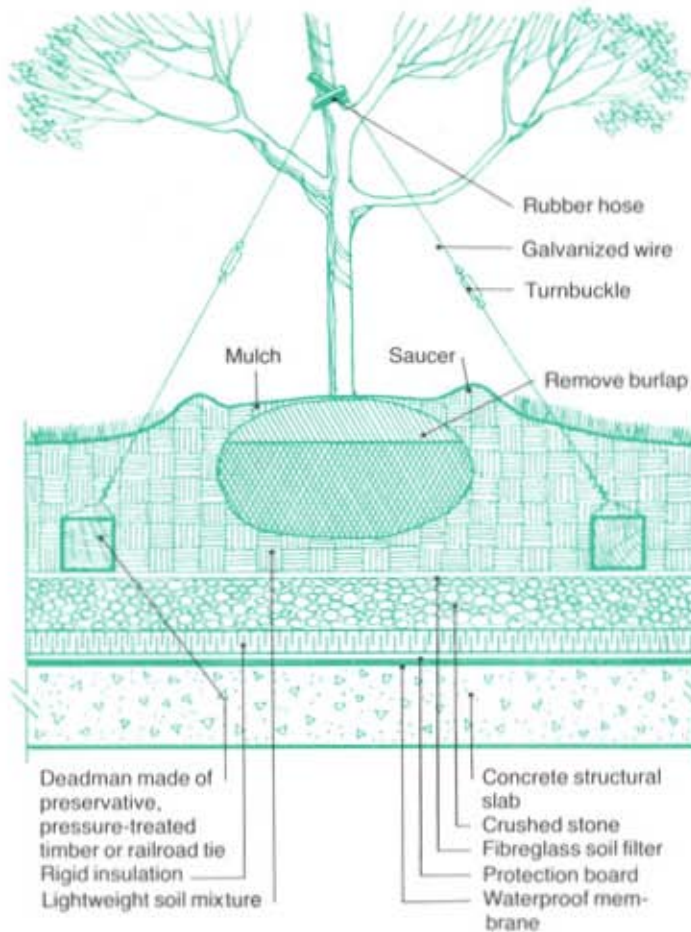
Method of planting a deciduous tree of over 65 mm on a roof deck.
